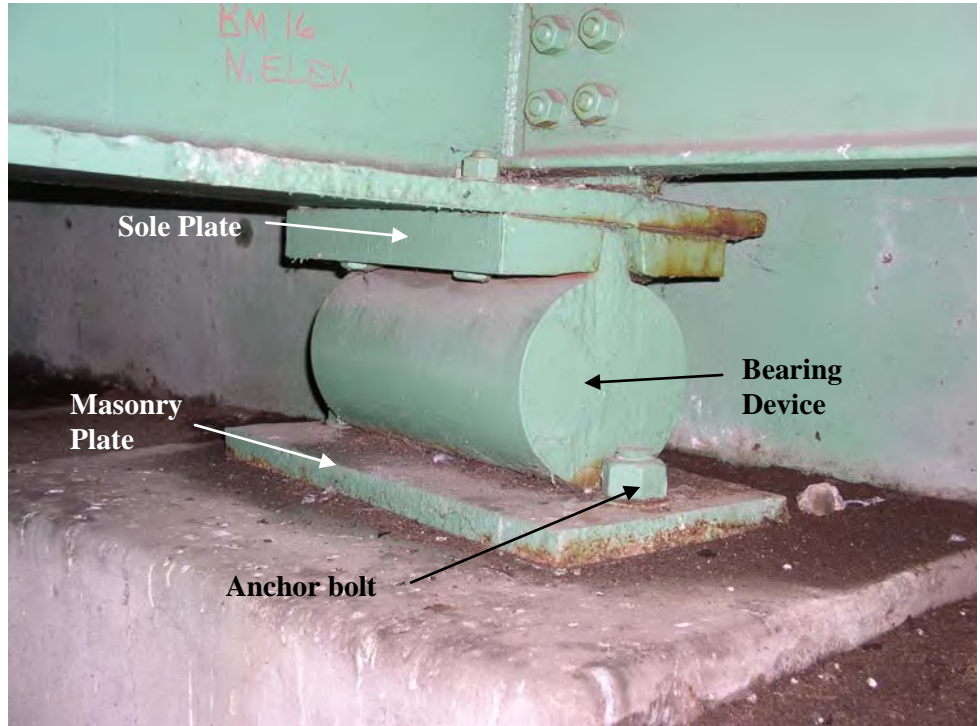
Steel Roller Bearing Showing Four Basic Elements
